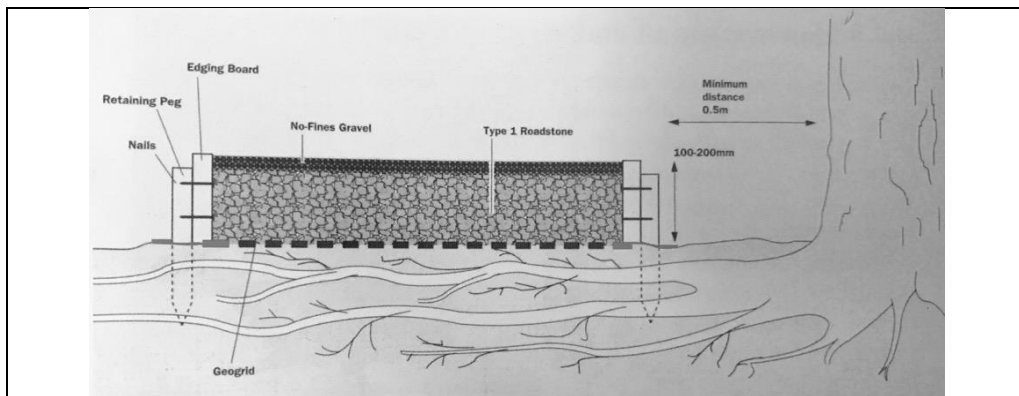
Image C: An image from 'Tree Roots in the Built Environment'⁴, showing how to construct hard surfacing above a tree's root system without excavation. Type 1 Roadstones are an example of blue metal or crushed sandstone.
